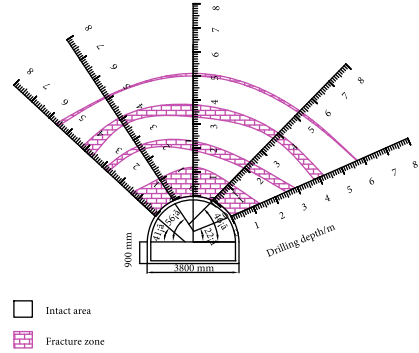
Failure of surrounding rock in 213 floor roadway.
